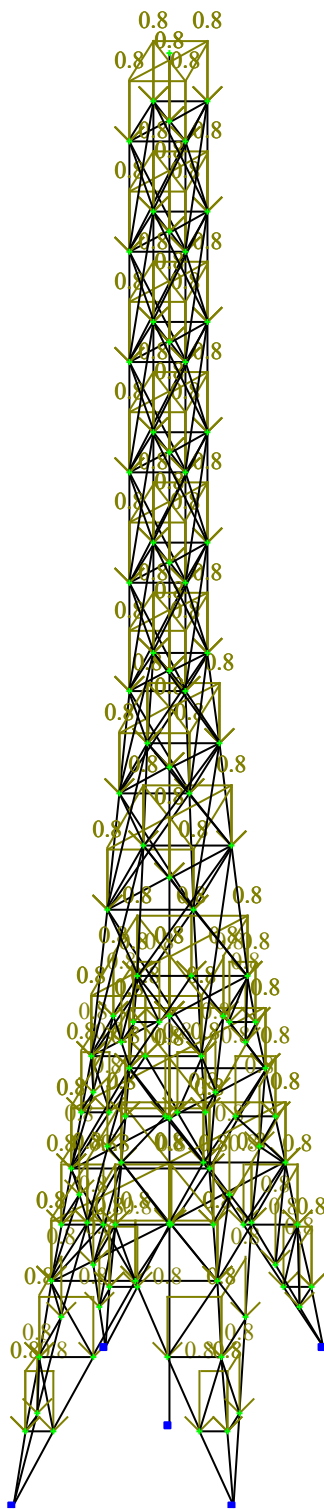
Loading 3. Snow load on the tower in the Lira-SAPR
